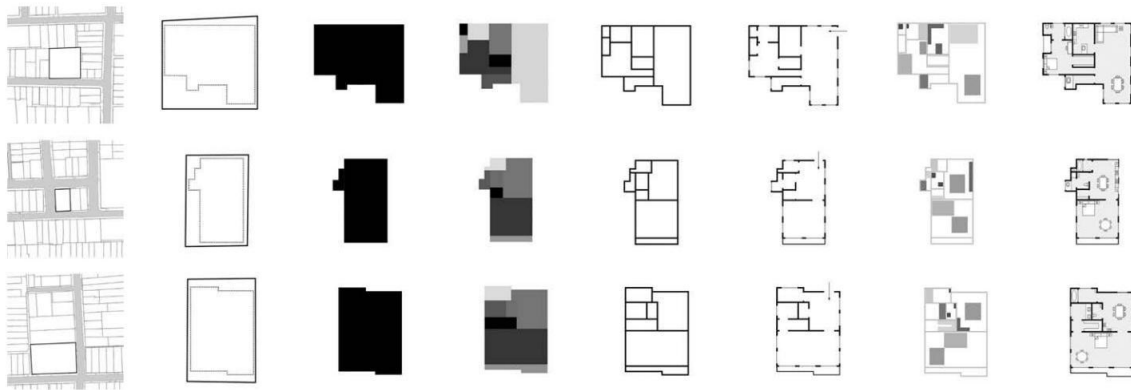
Multi-step indoor space design plan generation. Source: (Chaillou 2021)
